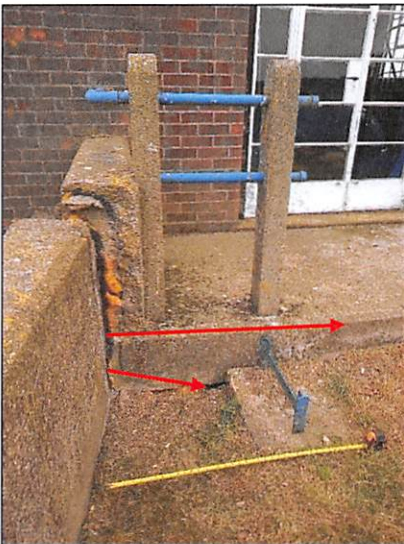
Cracking parallel to the concrete retaining/wing wall. Indicating settlement of the soils to the south (right of photo) of the wall. Taken from the west side of the pumping station, looking east
